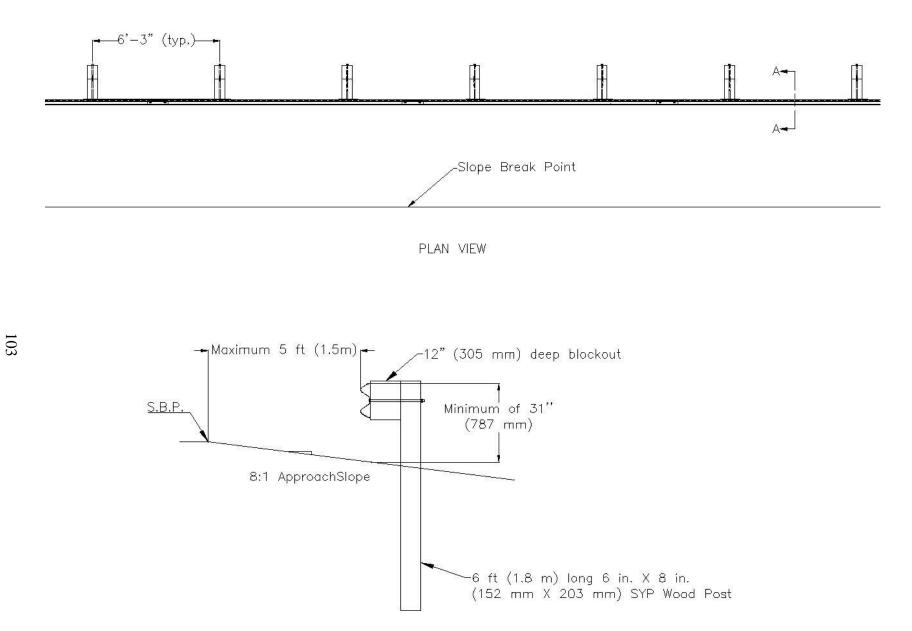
Use of SYP Wood Post MGS on 8:1 Approach Slope
